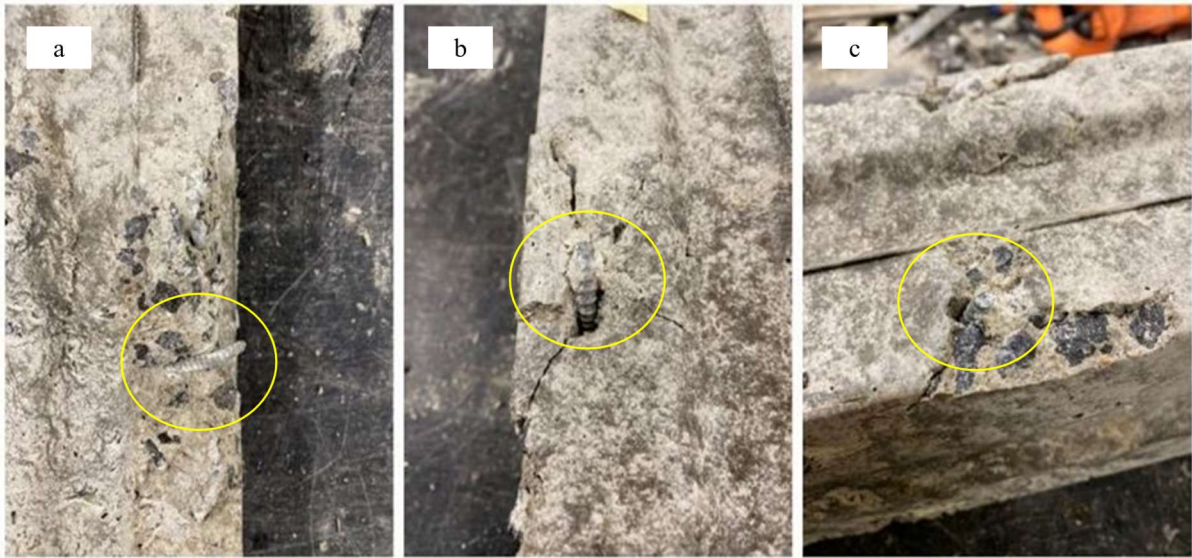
Screw failure (a) ductile bending with crushing of concrete around (b) screw head shearing with moderate cracks (c) bending of screw inside the concrete without much crushing.
